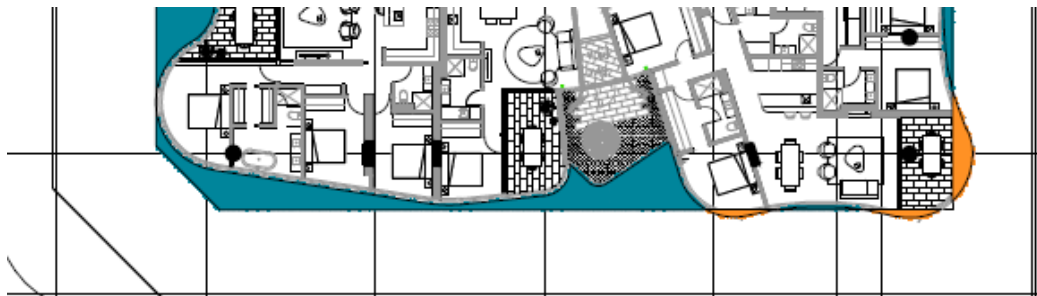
Kishorn Road and Forbes Road (Level 1) Setback Encroachments in Orange and open (compensating) area in Blue
